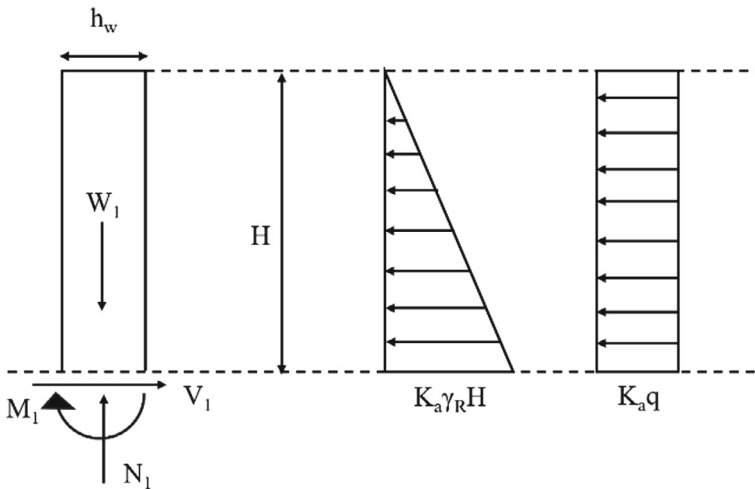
Forces acting on the cantilever wall and sectional effects at the base of the wall
